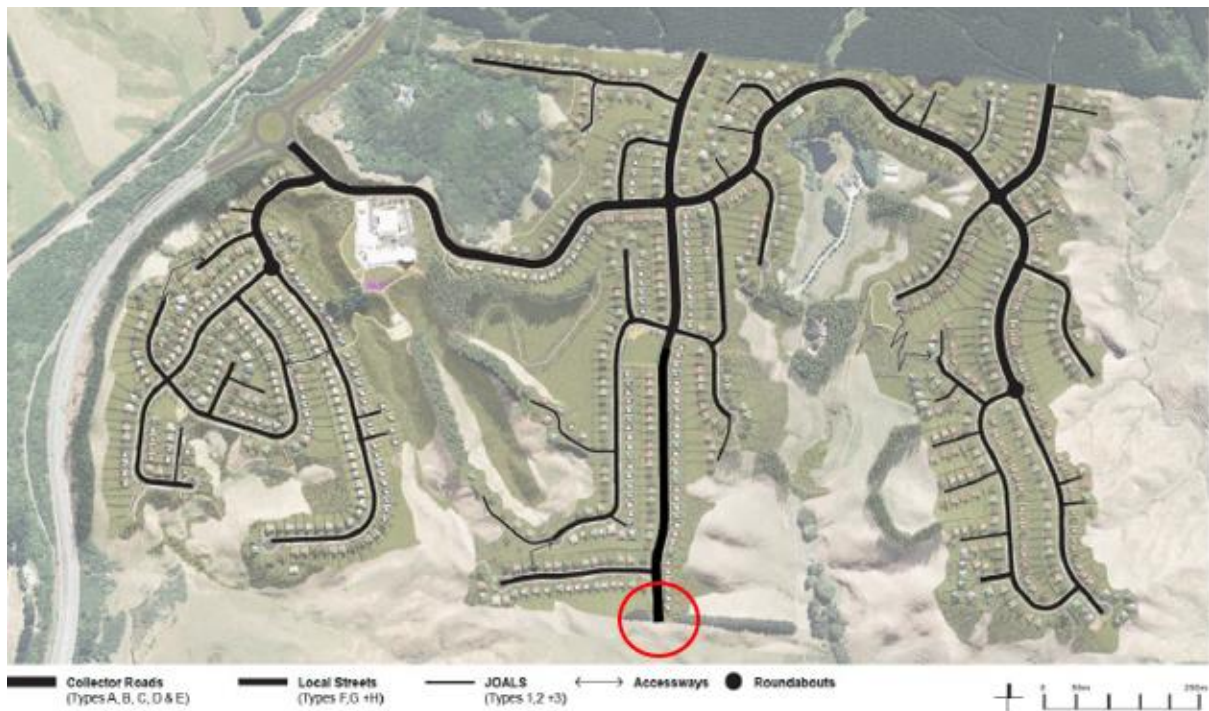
Structure plan with roading connections required to the south labelled as 1 - 3
